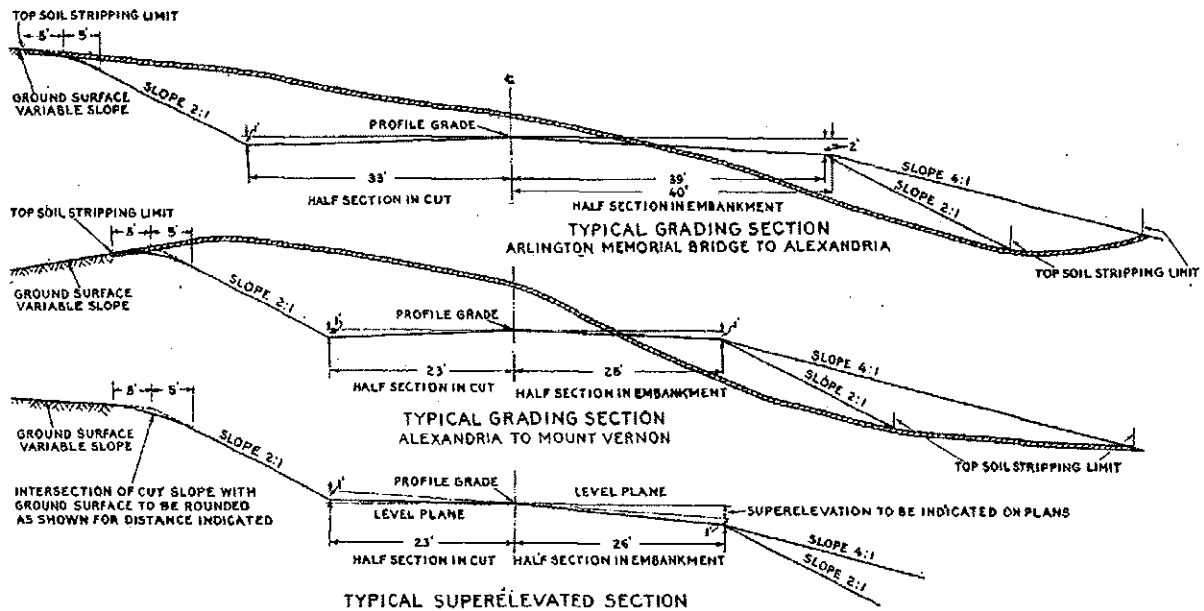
Typical sections for the land grading. Three level sections have been used of such width and cross slope that a lateral movement of the earth excavated for the subgrade will provide a sufficient amount of material for the proper slope of the shoulders. Provision has been made for stripping suitable top soil and storing it beyond the limits of the slope stakes so that it can be used to cover the shoulders and slopes.
